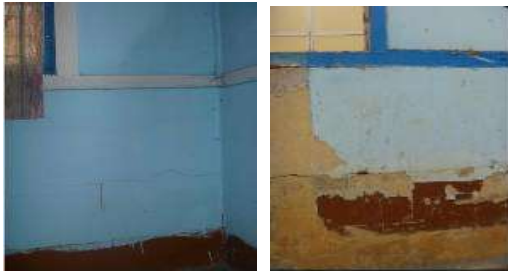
Cracks at different interior and exterior side of the brick wall
